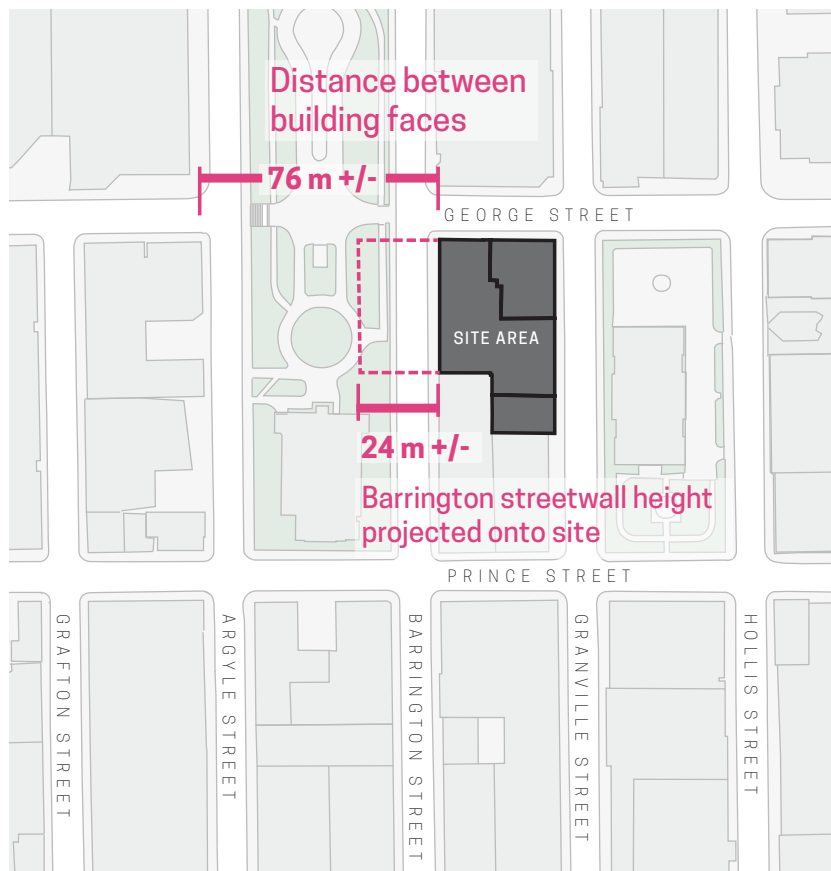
b Streetwall Height: Site context plan showing proximity to prominent public open space and projected streetwall. Using the actual distance to the next building face, the ratio is approximately 1:3 streetwall height to street width.
